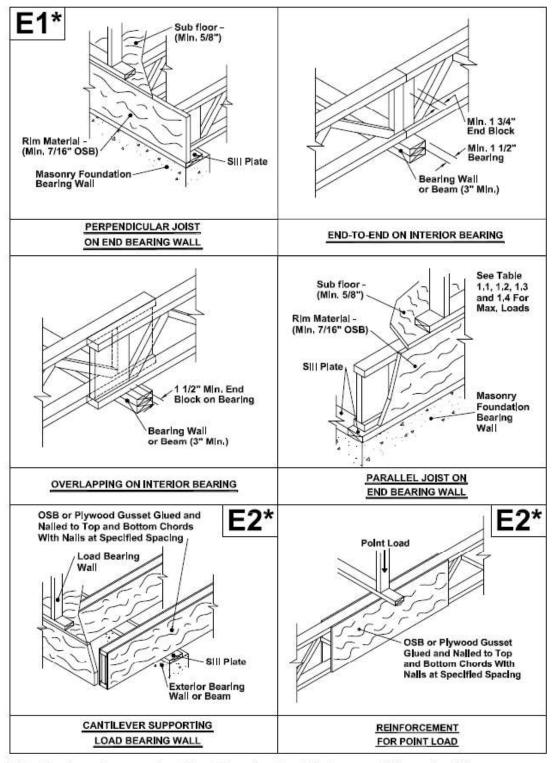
TYPICAL OPEN JOIST 2000 WOOD TRUSS AND DETAILS (MEMBER SIZES VARY)
